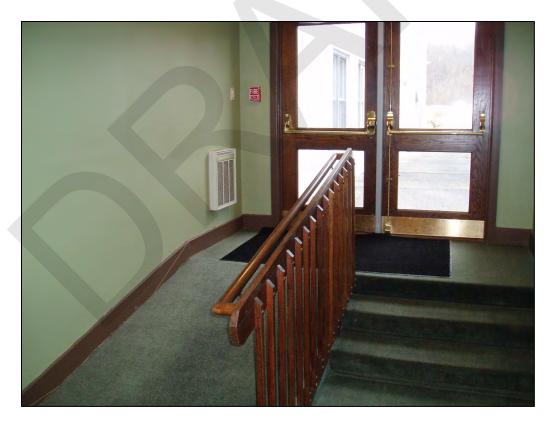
Floor 1-Ground, Room 12 bar looking NW toward the Room 13 doorway (Field Photograph P1010075, 2/10/2020).
